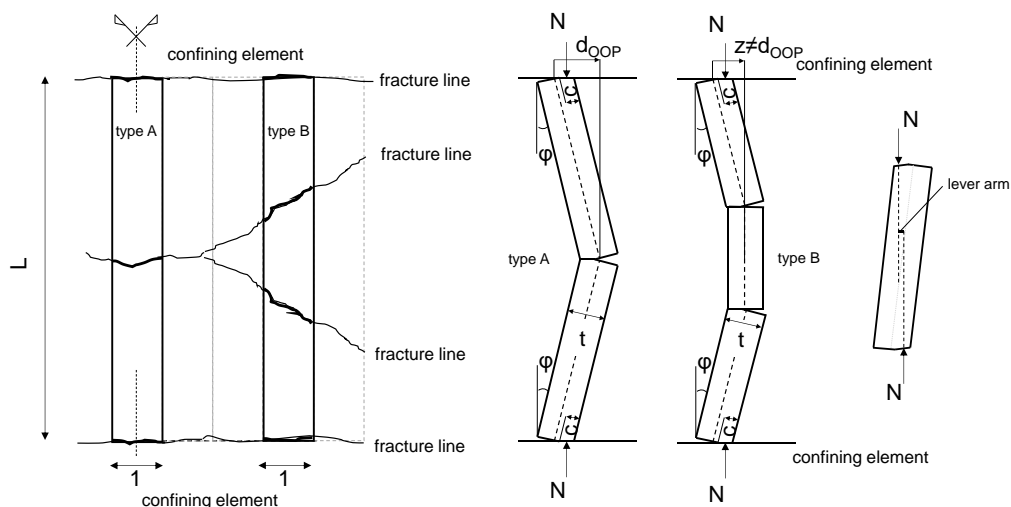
Deformed shape of a type A and type B stripes divided by fracture lines in separate parts rigidly rotating about their ends. On the right, a particular of a stripe single part.
